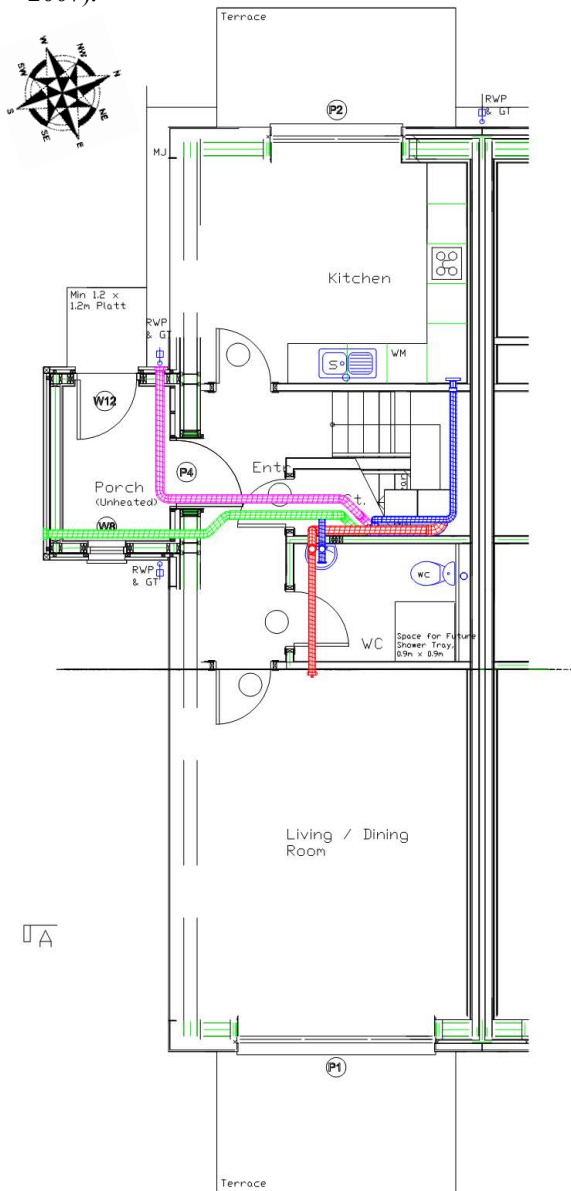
Passive House Floor Plans ((Divici, 2011))
